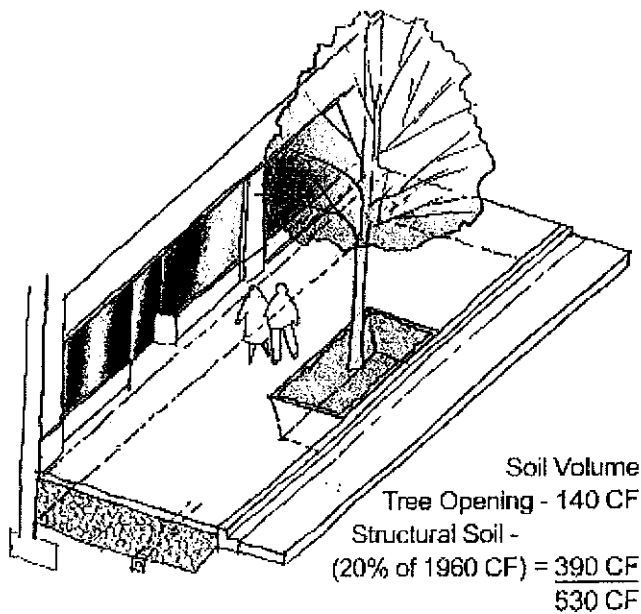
B.22. Soil/aggregate structural soils. Note that only the amount of soil in the structural soil mix is counted as available for tree rooting.
